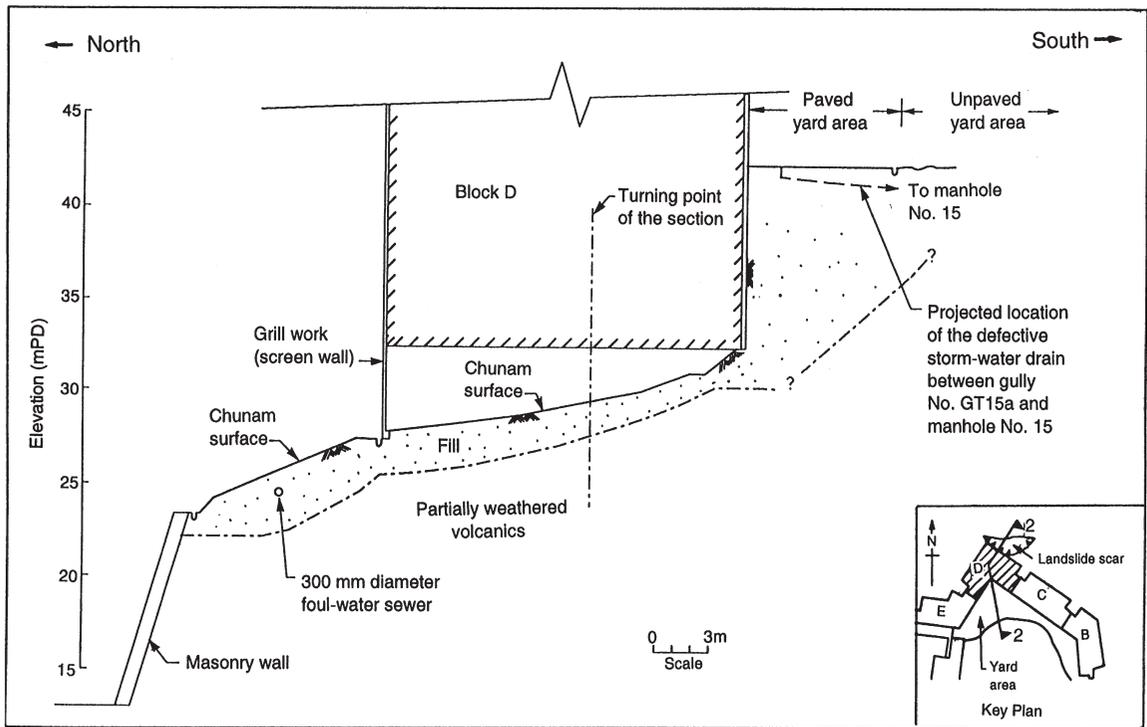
Section 2-2 through the landslide location, Block D, and the yard area
